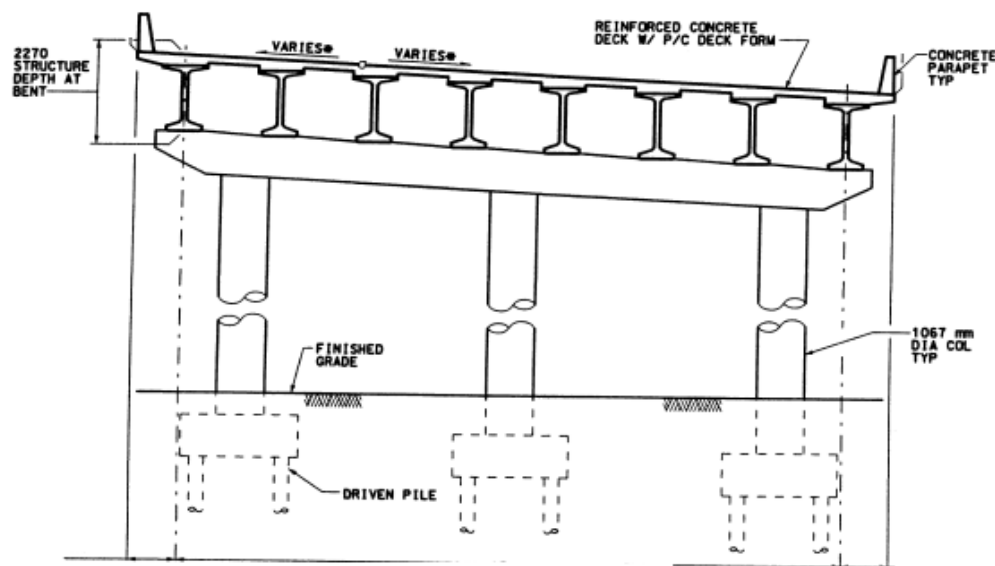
Cross-Sectional View of the 400 South Street Bridge at the Bent
